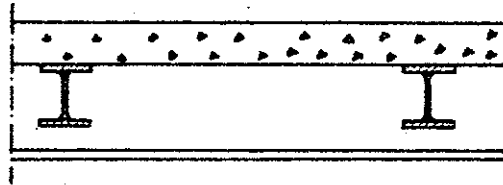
Floor structure, composed of a reinforced concrete slab, load-bearing steel beams, and an insulating ceiling
